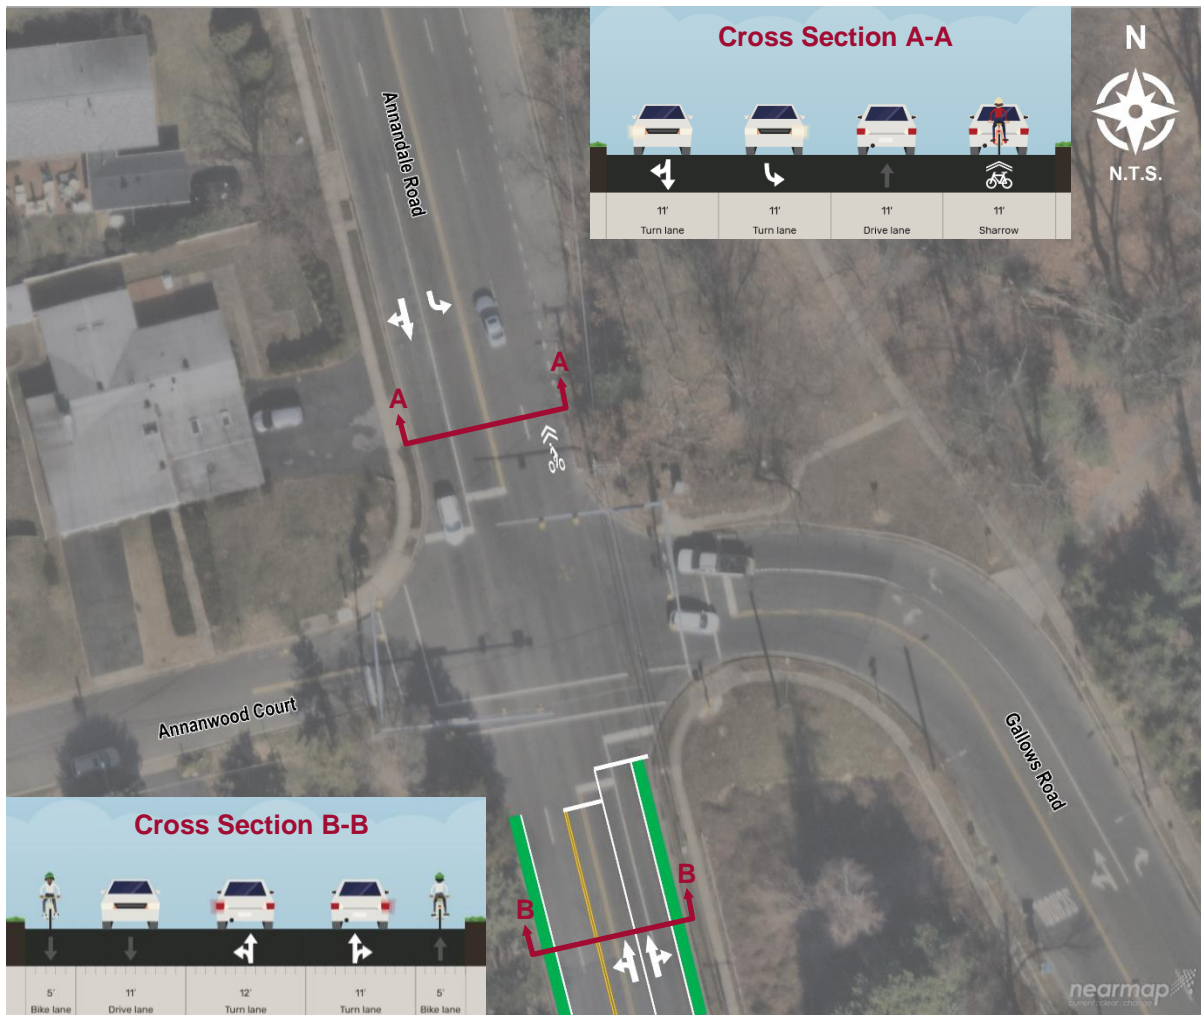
Intersection of Annandale Road and Gallows Road Build Conditions Cross Section and Plan View
